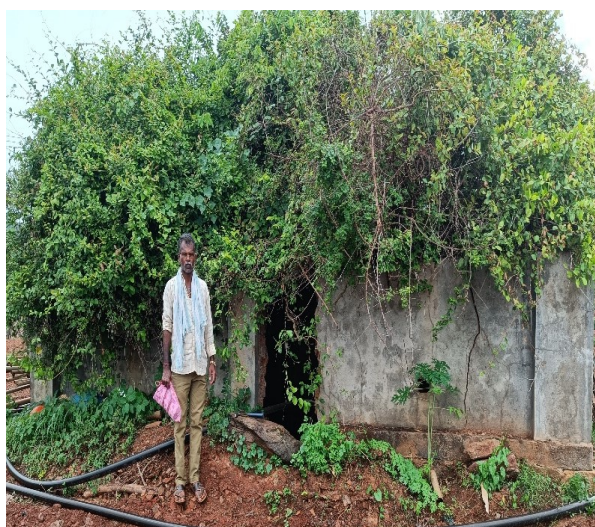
Field photograph showing old working shafts (Turnbull shaft).
